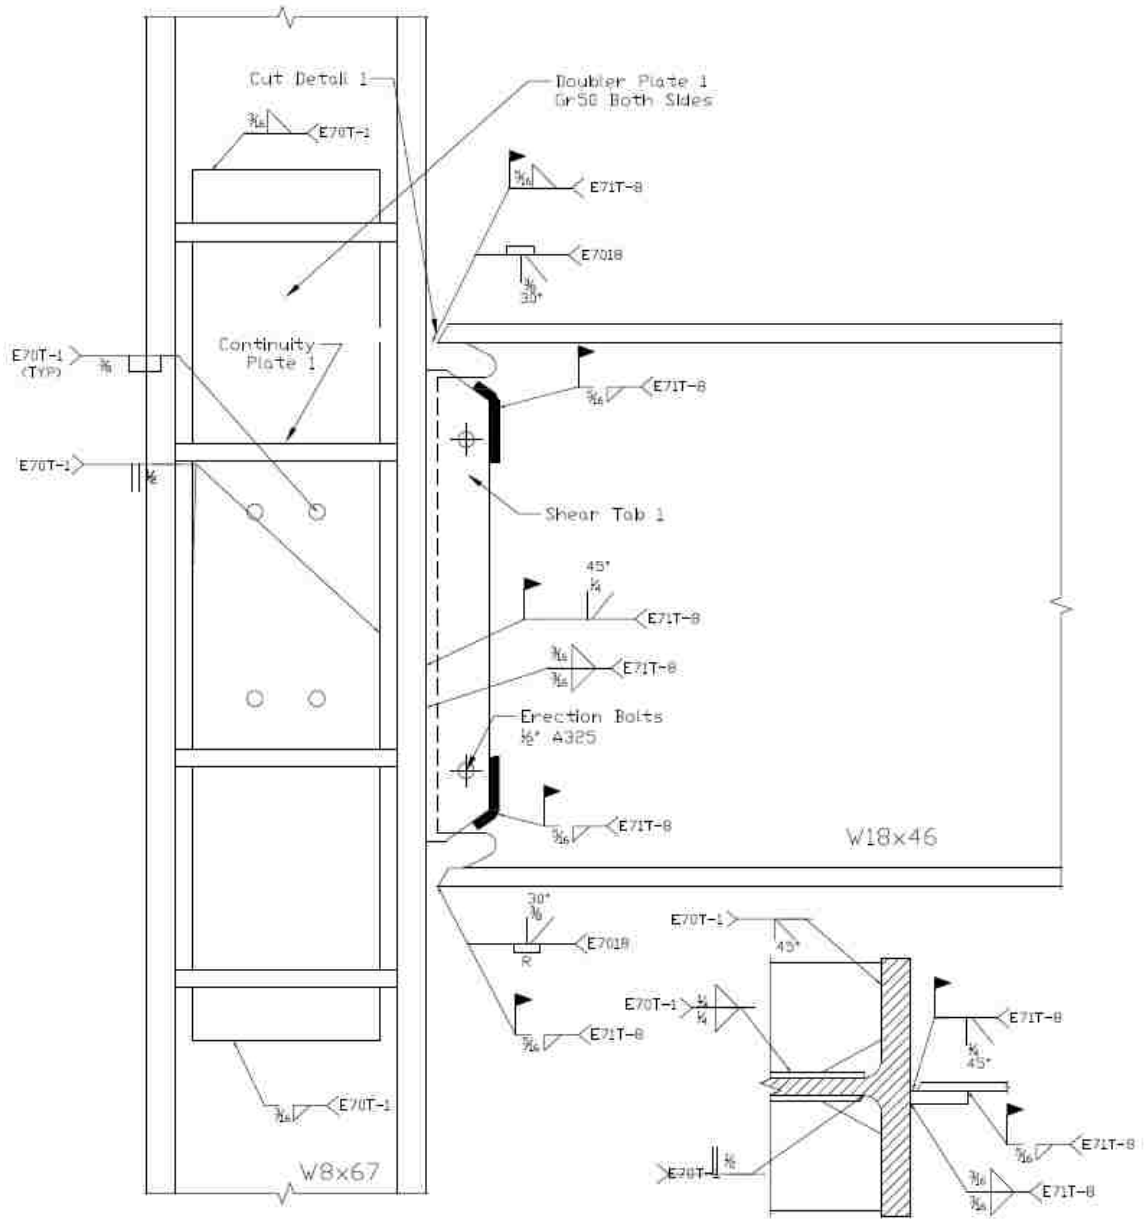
MRF Ground Floor Beam-to-Column Connection Details
